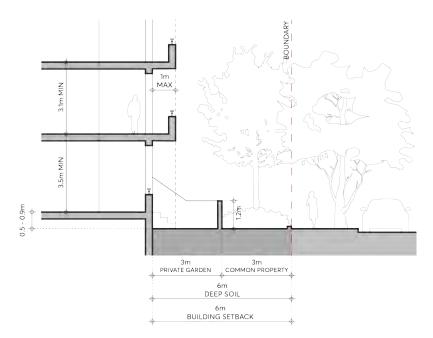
Ground floor interface and floor to floor heights
